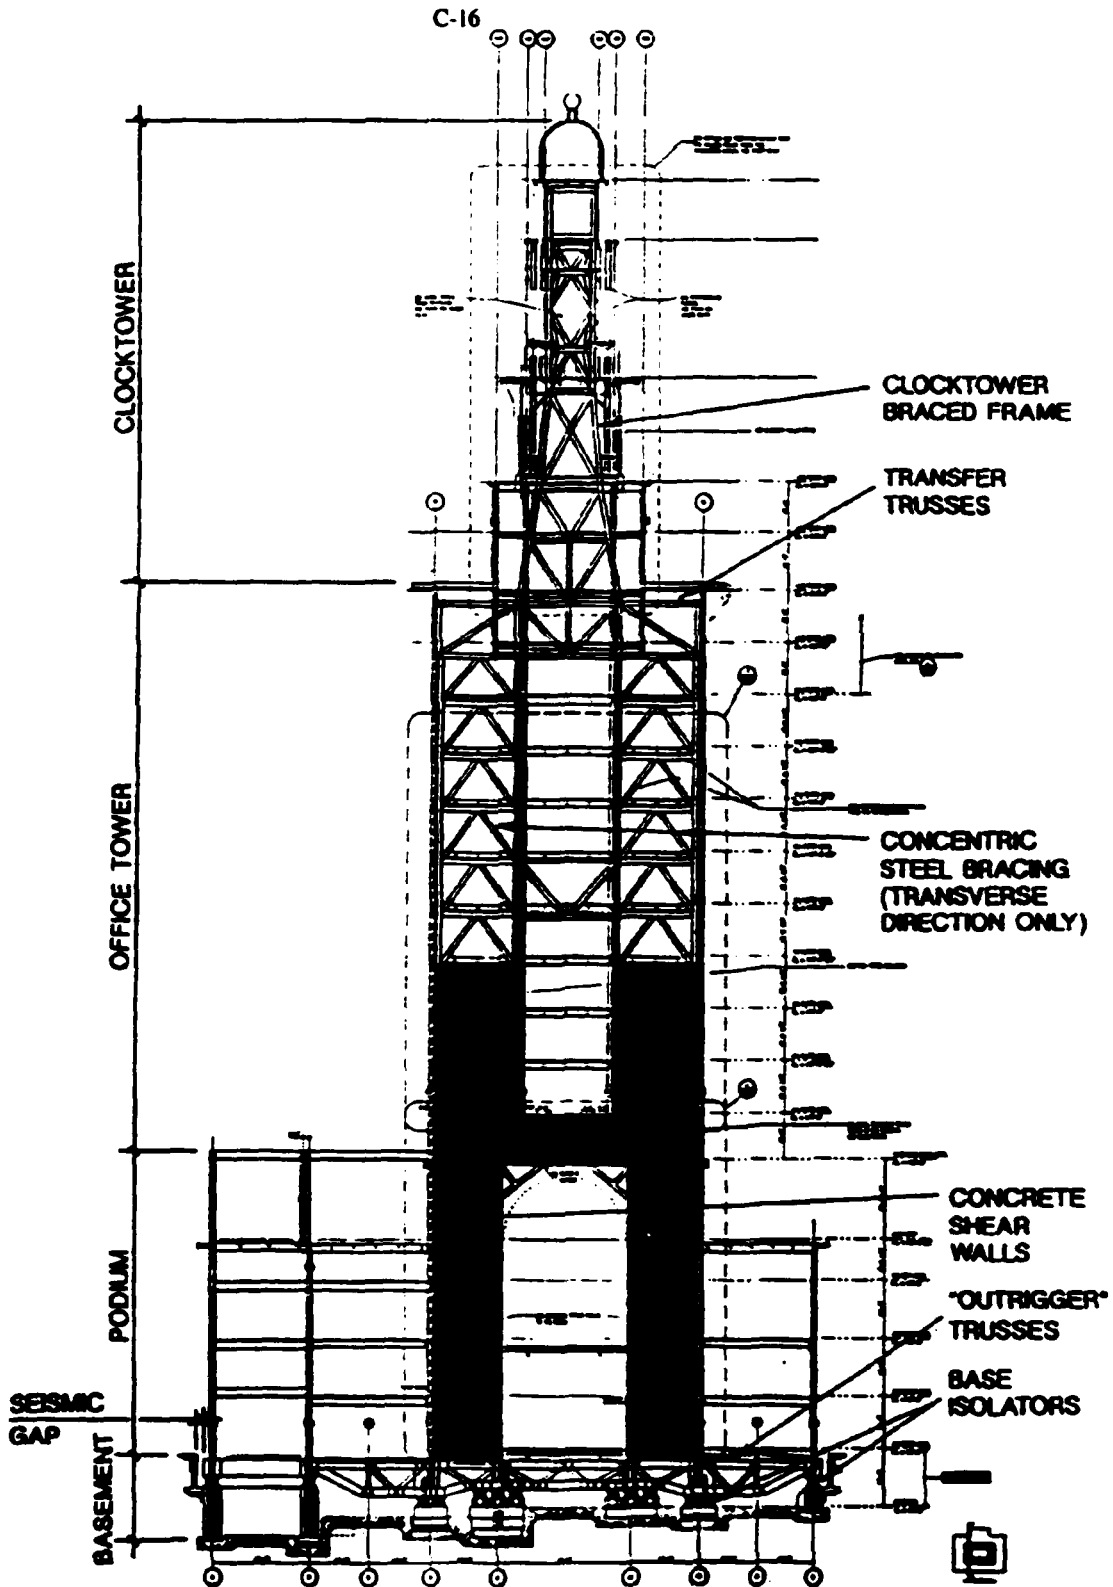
Typical section, Oakland City Hall, California (from Reference 8)
